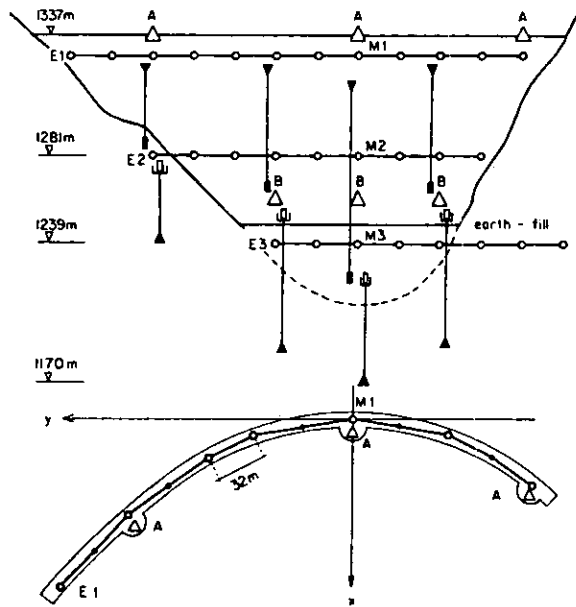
Traverse net: traverse- and alignment points, pendulums, connecting points
